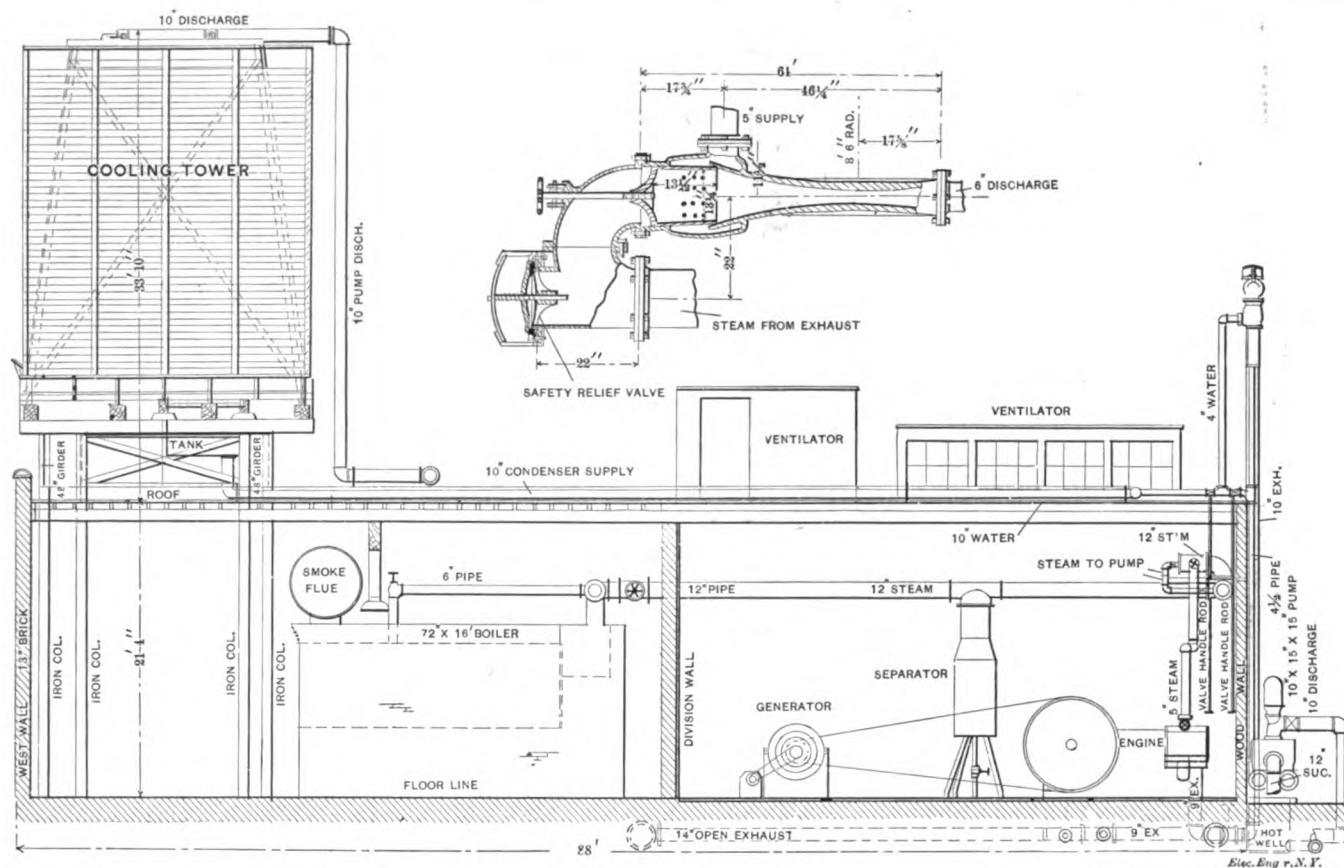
Cooling Tower and Condensing Arrangement, Hyde Park, Ill., Thomson-Houston Light Co.—Sectional Elevation.
